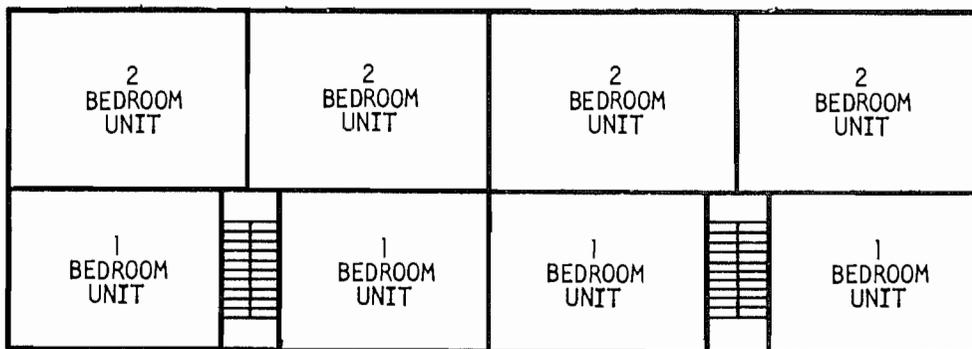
Floor Plan for Characteristic Low-Rise Structure
